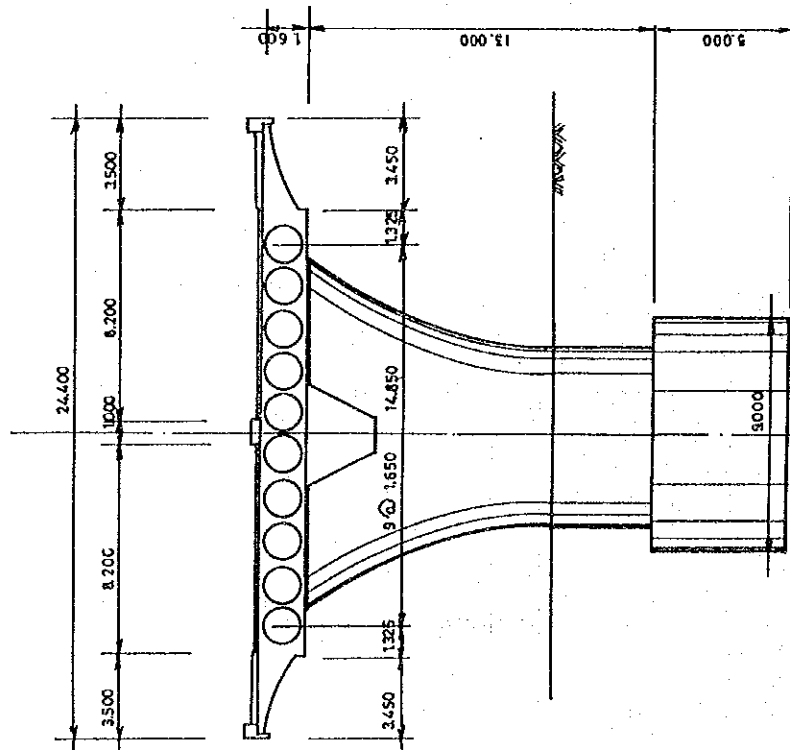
Continuous Post-tensioned Concrete Hollow-slab with Solid Shaft Pier on Caisson Foundation
